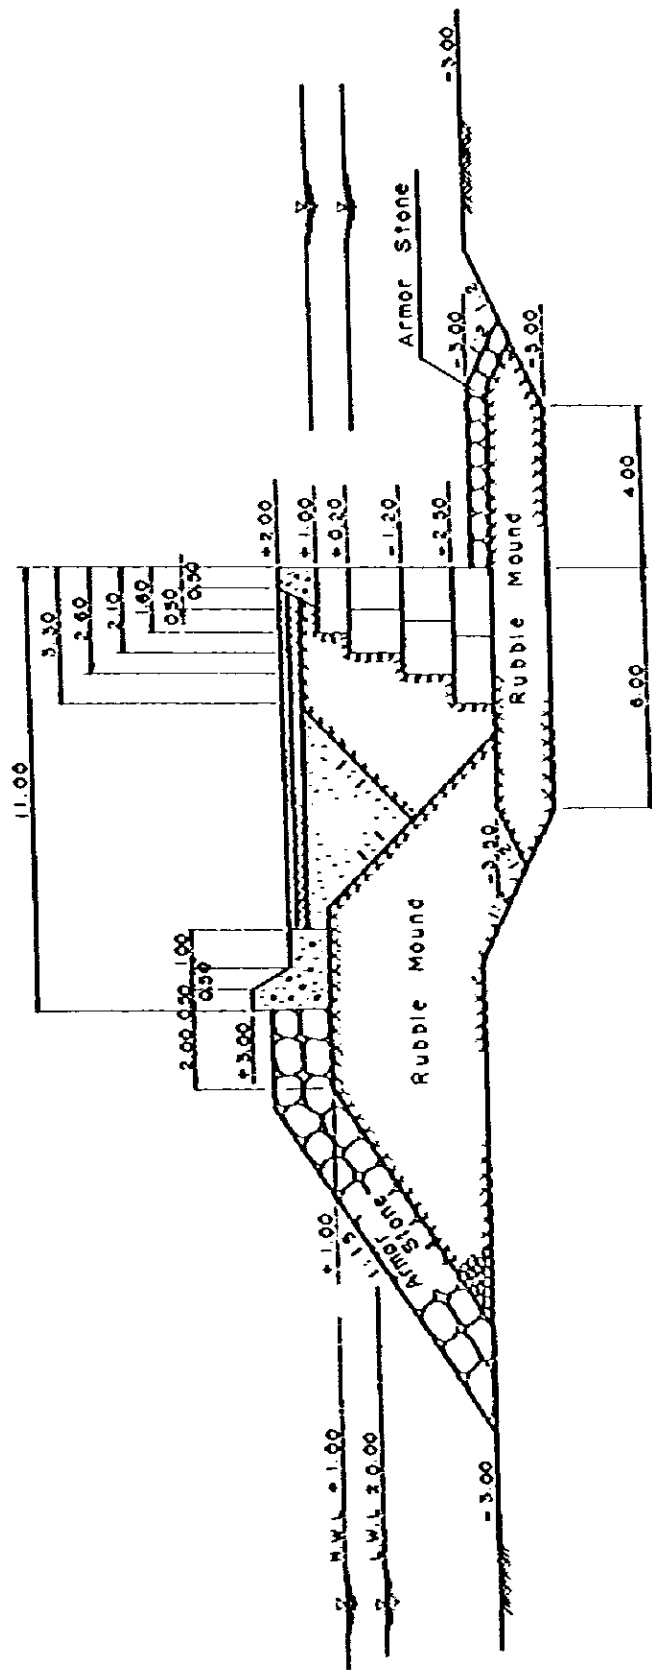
Typical Cross Section of Breakwater and Wharf (- 3.0 m)
